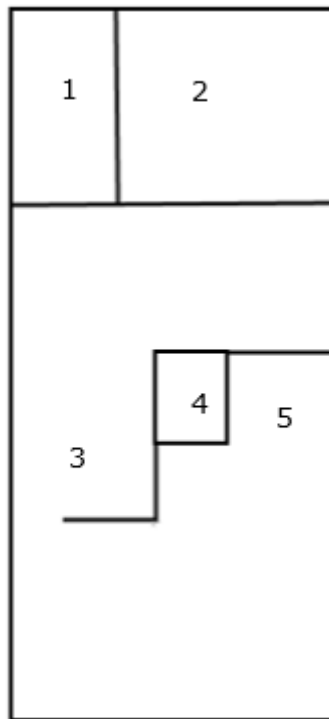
The ground floor and simplified plan of the internal space (not to scale).
